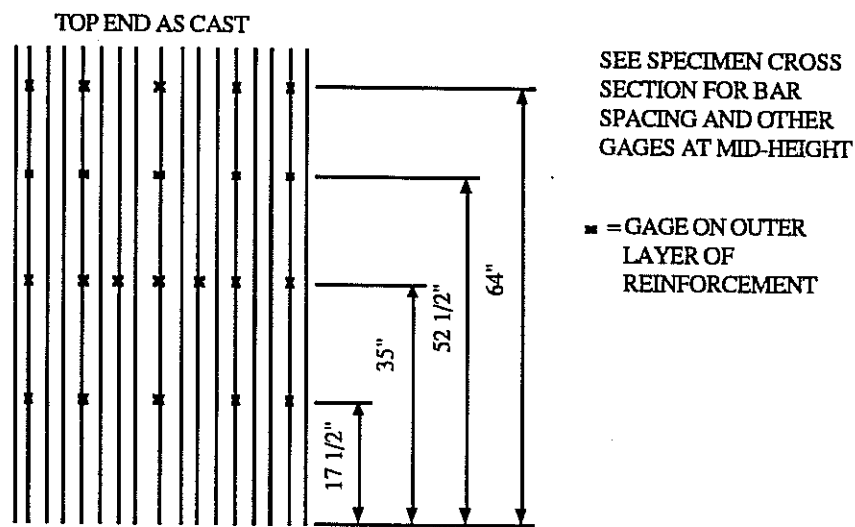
Gage Positions on Compression Face, Specimen 3M14
